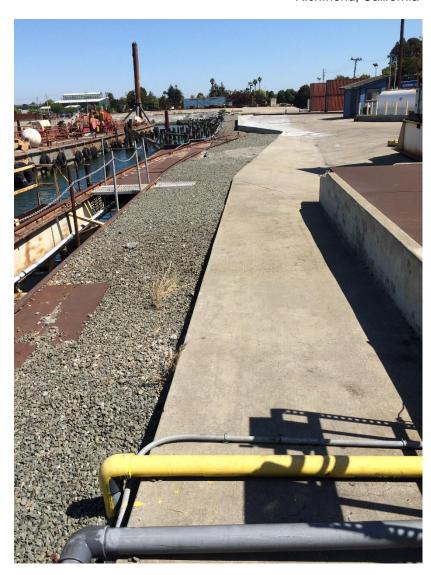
Looking north: gravel cover to the west of treatment system TS-2 and interceptor SW-5.
